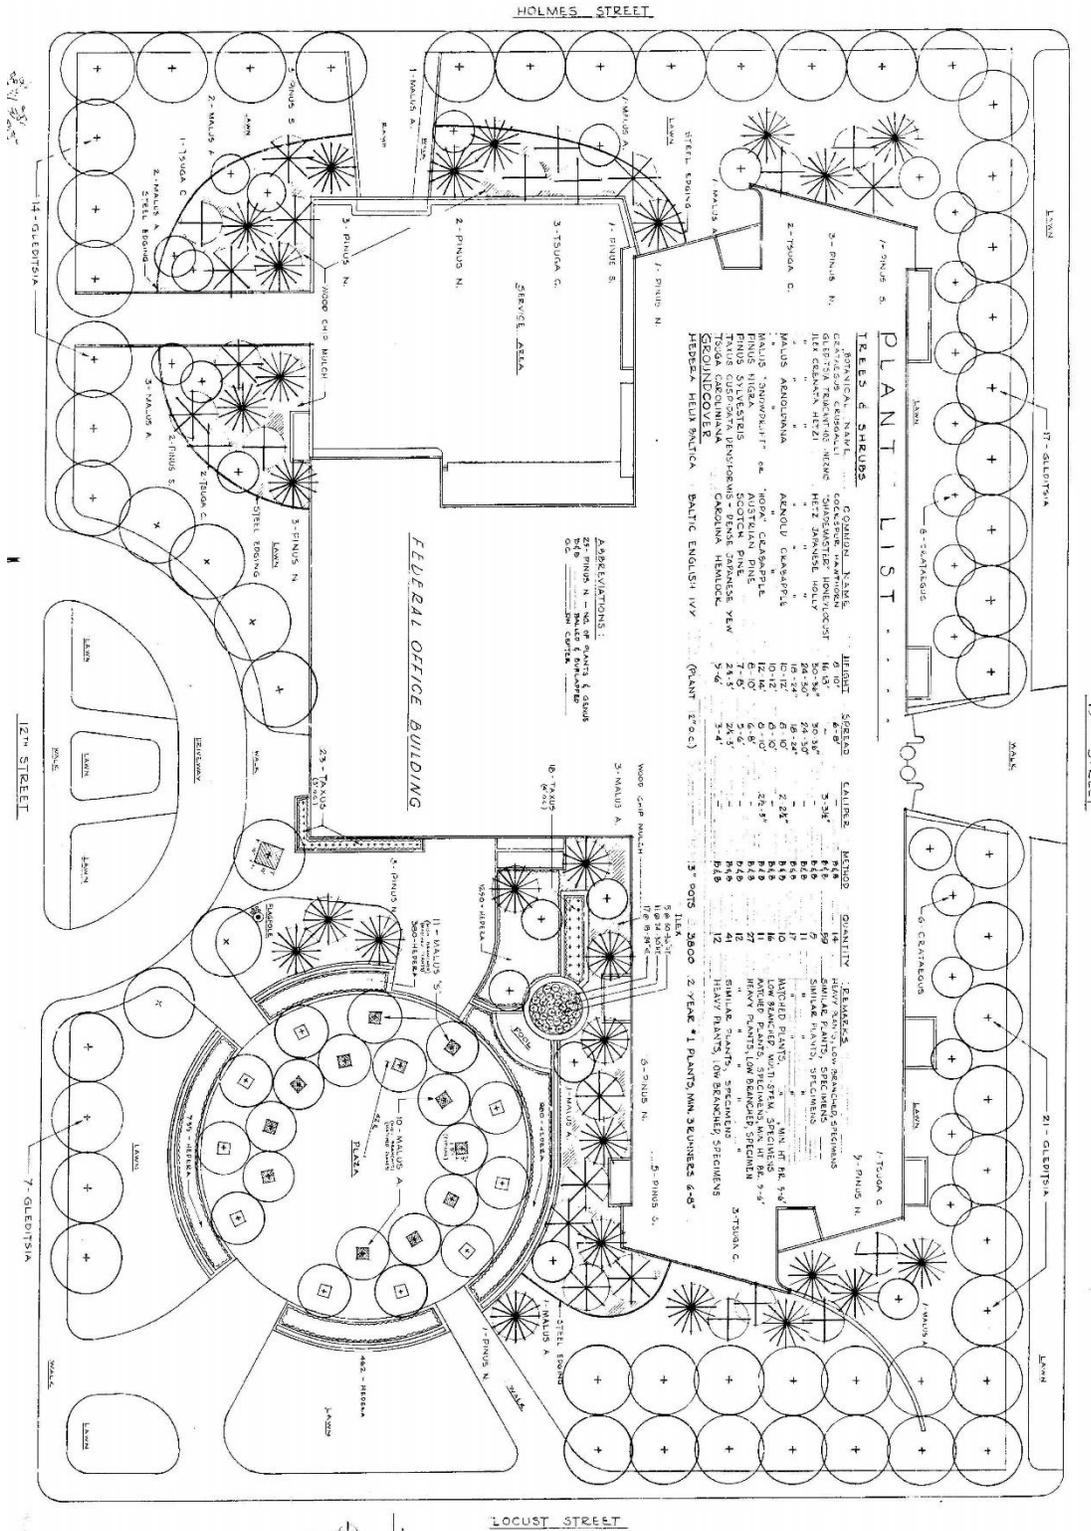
Federal Office Building Planting Plan, 1961 (west at bottom of drawing)
